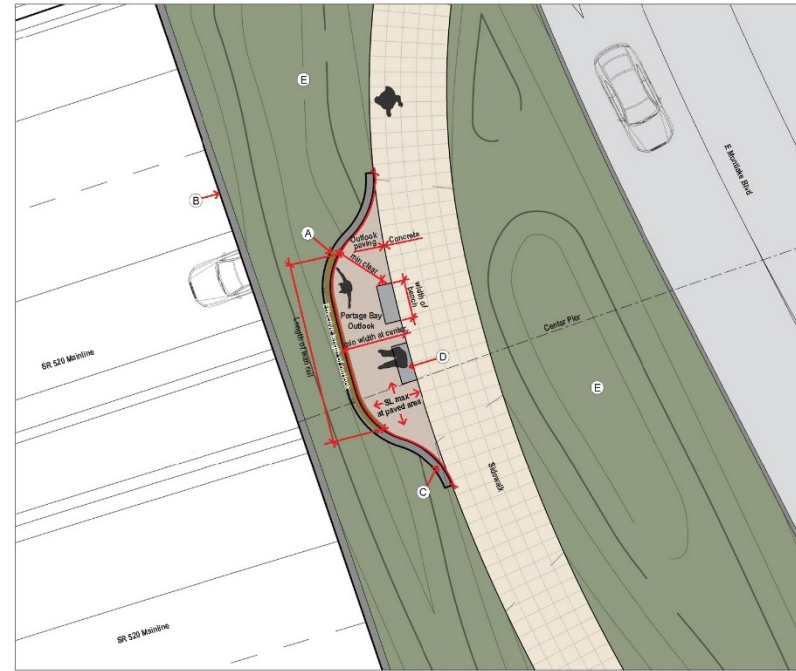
Pedestrian land bridge outlook enlarged plan
